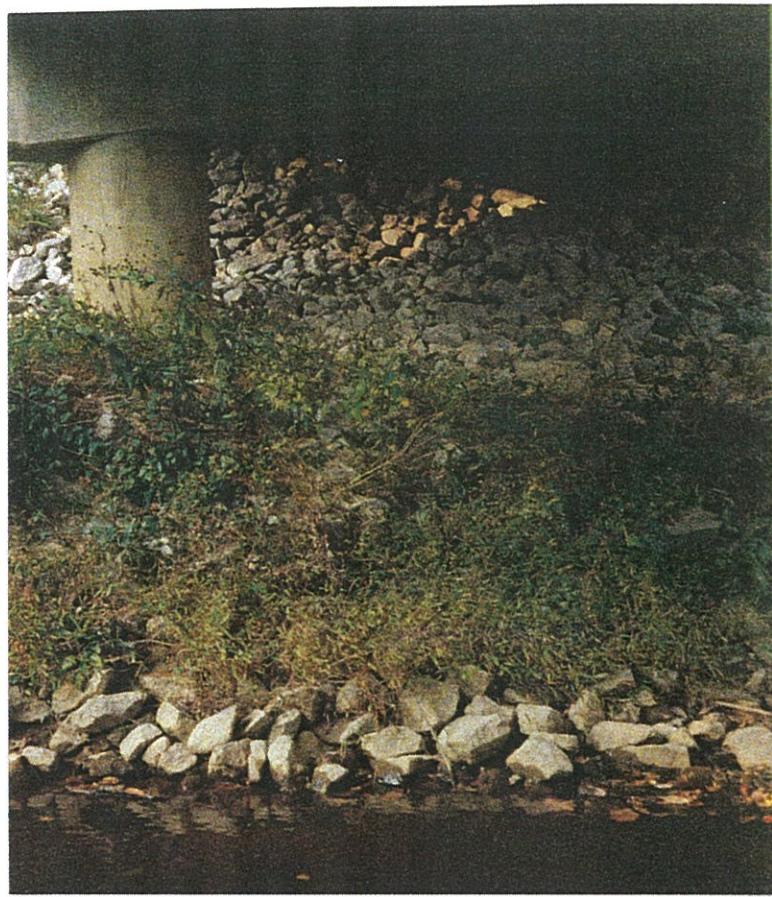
View looking downstream at bridge from rock outcropping in Photo 3.
